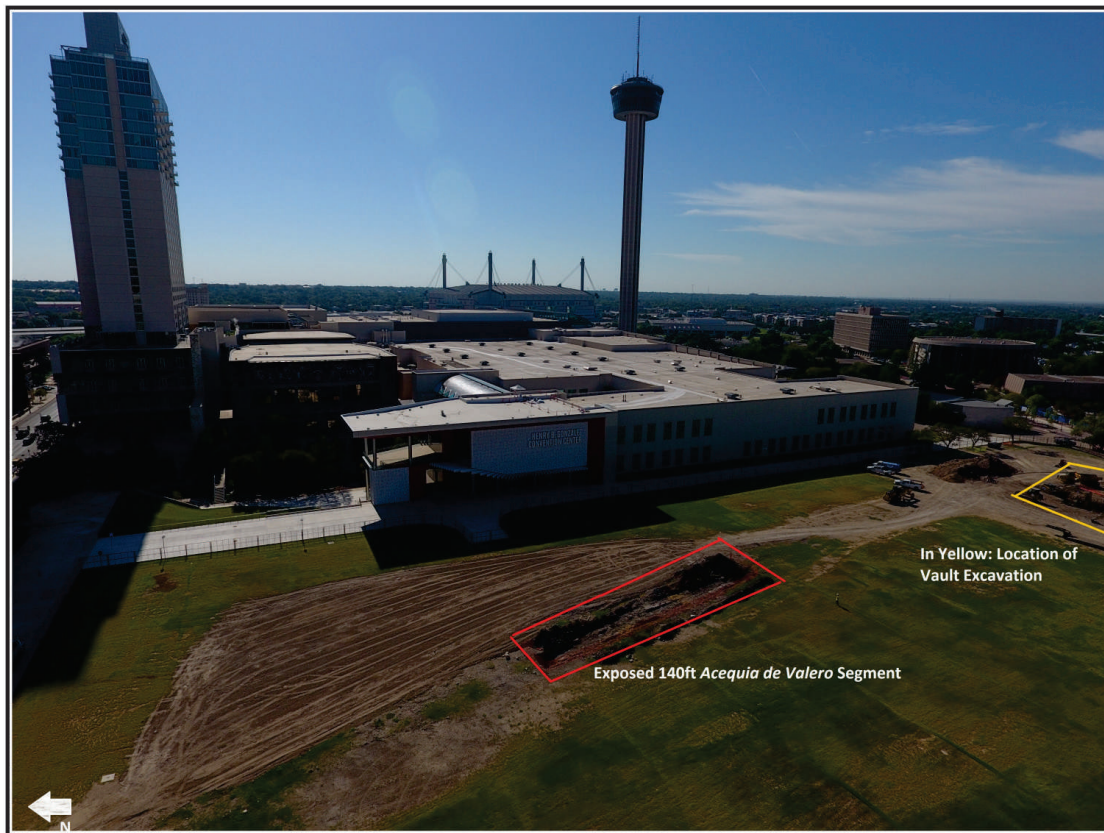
Exposed acequia in relation to the Convention Center and vault excavation, facing east (photo courtesy of Guido Brothers Construction Company).
